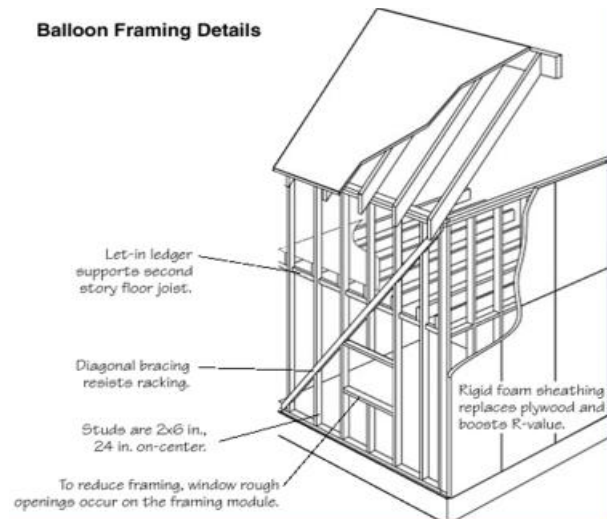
Balloon frame house showing continuous wall studs from foundation to top plate on wall. Floor joists rest on “let-in” braces cut into studs.
